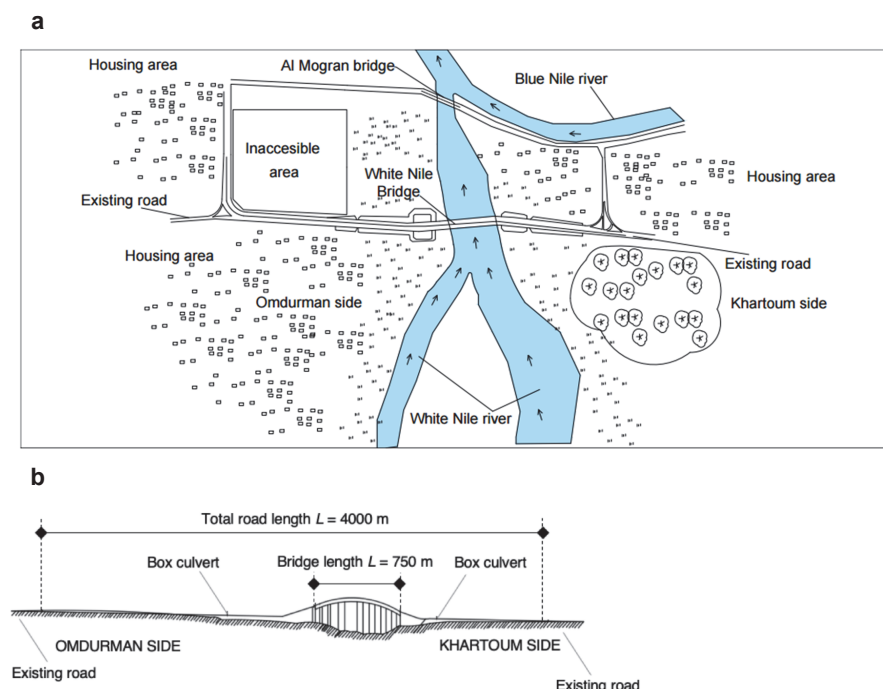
The White Nile Bridge location, connecting Omdurman and Khartoum: a – plan view, b – profile view
